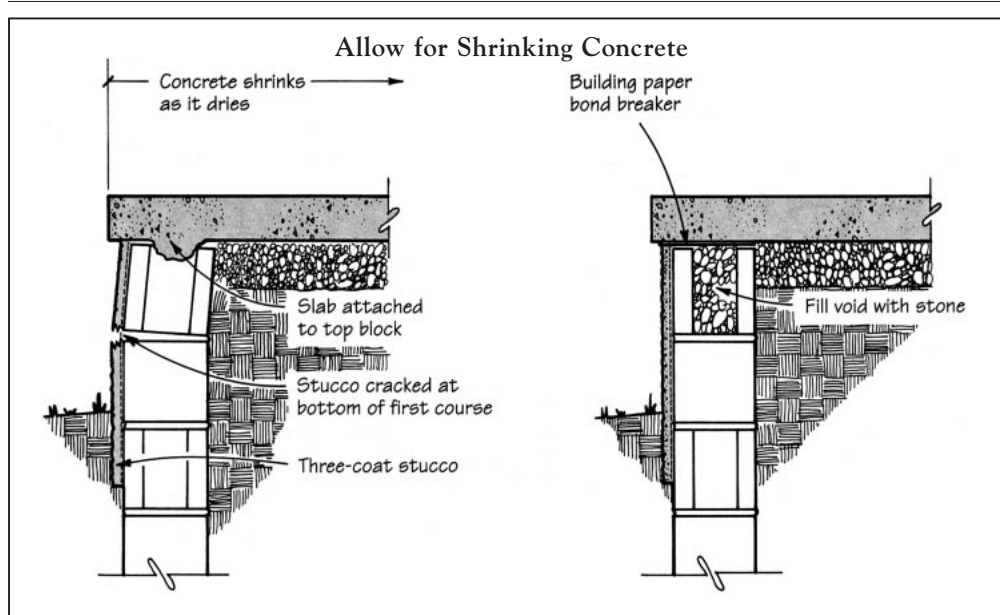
A patio slab poured directly over a block retaining wall (left) will crack the wall when the concrete dries and shrinks. Using a bond breaker of building paper (right) prevents the slab from attaching to the block, allowing the slab to shrink without cracking the stucco.
